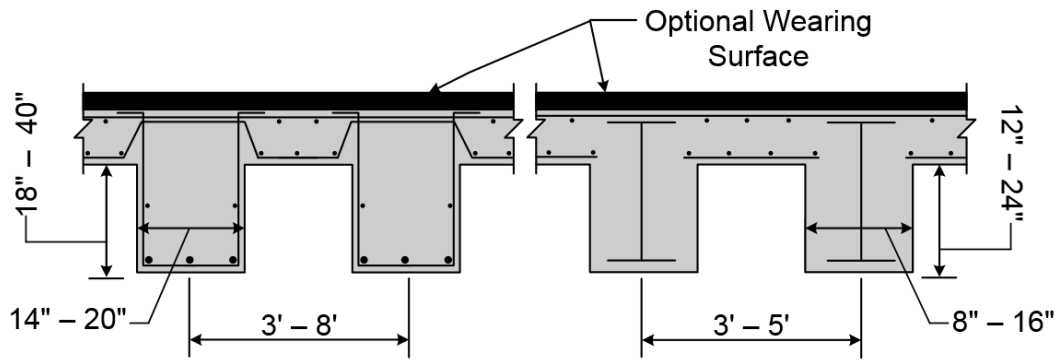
Comparison Between Tee Beam and Concrete Encased Steel I-beam
